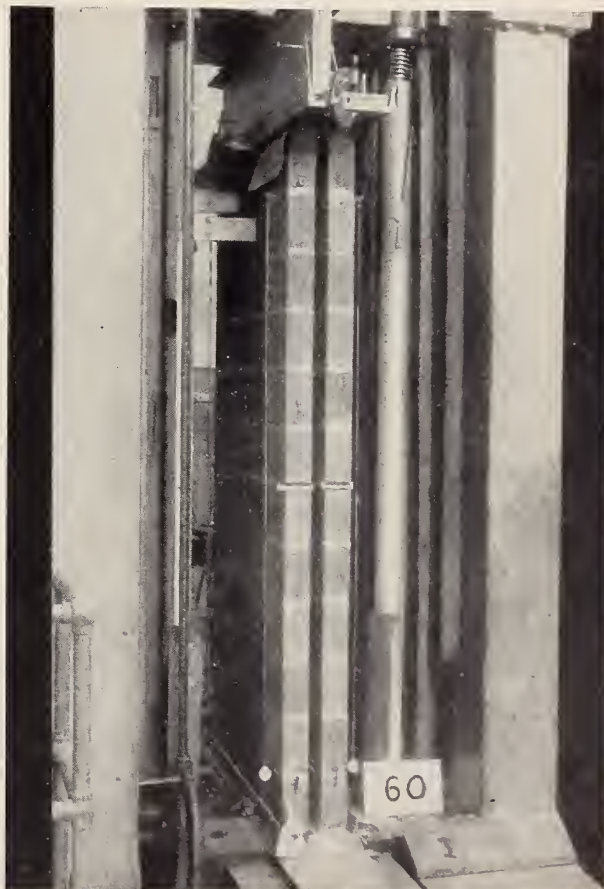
Concrete-block cavity wall under compressive load. Load was applied through a round steel bar above beam (not visible).
